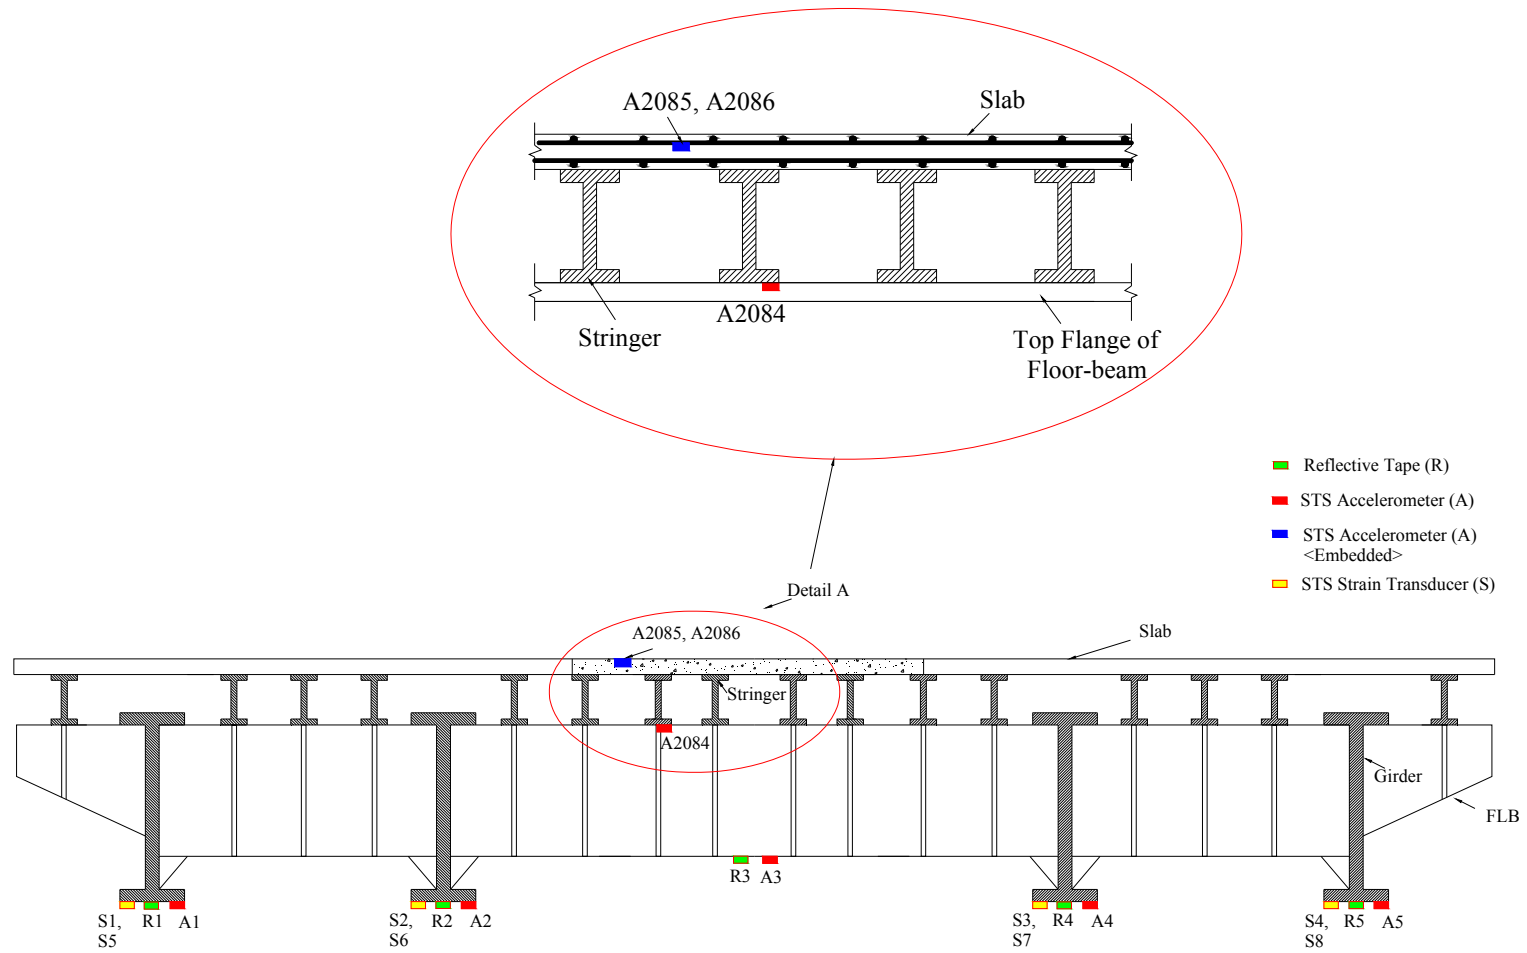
Section view of sensor locations between Floor Beams 4 and 5
